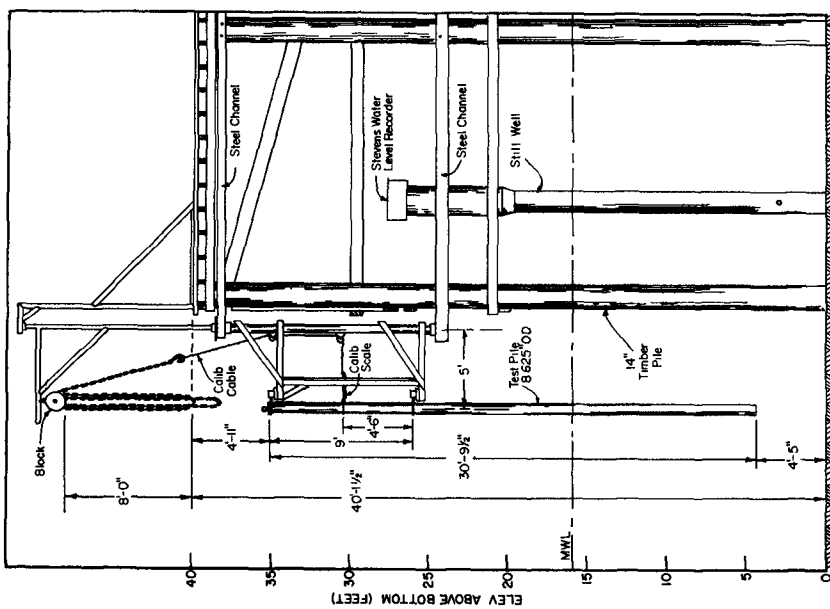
Scaled drawings of wave force installation at Sun Oil Company Pier, Caplen, Texas. The steel test pile was located on the southeast corner of the platform one-half mile from shore. The directional orientation of the pile support could be varied through an angle of 180° .
